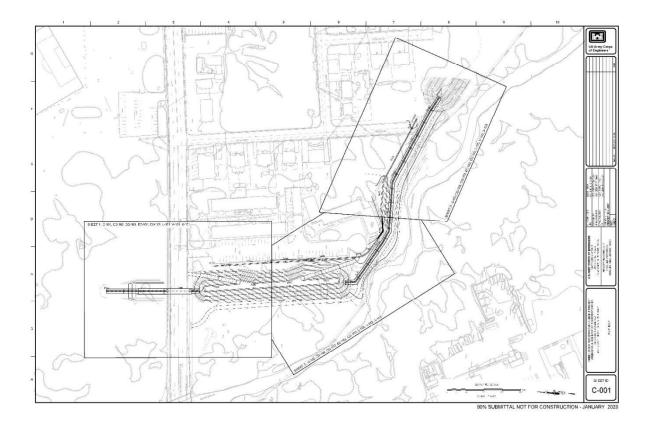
Green Brook Segment C3 & C4 Design Layout
